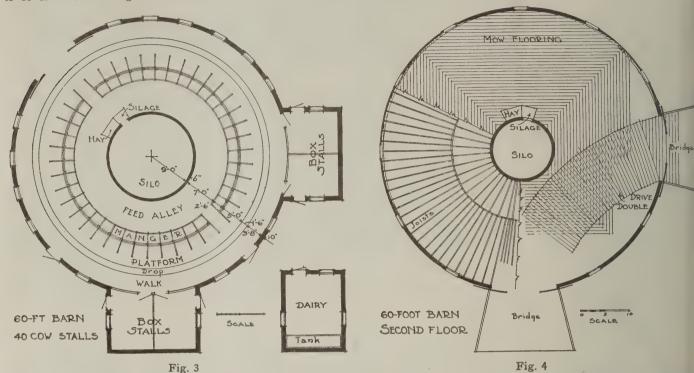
Box stalls arranged under the driveway approaches to the second floor. The dairy room is built separate from th barn. To supply this sized herd and the necessary young stock with silage for 8 months would require a 370-ton silo, or on 18 feet in diameter and 56 feet deep. With a 7-foot feed alley and a 2½-foot manger, the circle at the stanchions would be 3 feet in diameter, or 119½ feet in circumference; allowing 4½ feet for 2 passageways, the stalls would be 2 feet, 10½ inche wide at the stanchions, and 3 feet 6 inches at the top. Fig. 4—Radial arrangement of second floor joists. The number of joists under the drive is doubled. The mow flooring is 1x8-inch shiplap laid in four directions. The floor of the driveway indoubled
